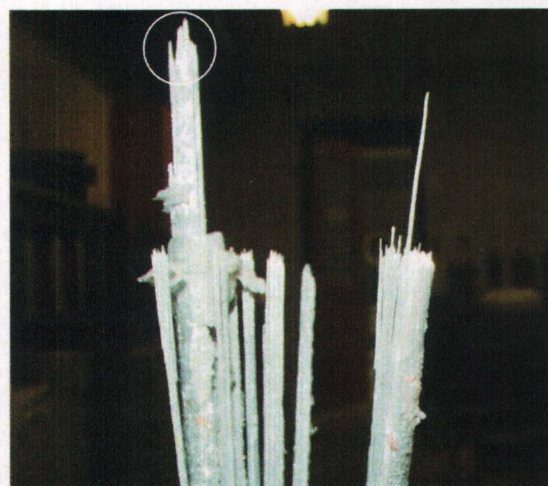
Photos of failed Specimen Isorod 25-75% Water #2.
